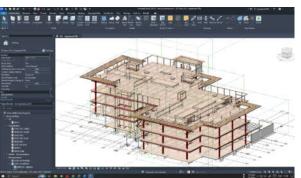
AutoCAD 2D layout to Architectural 3D plan
